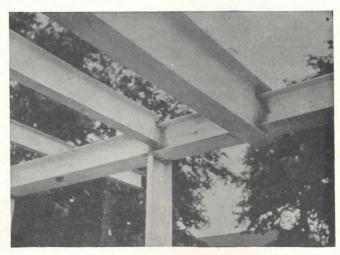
Framework for loading dock contains channels, I beams, angles and Z-bar.
